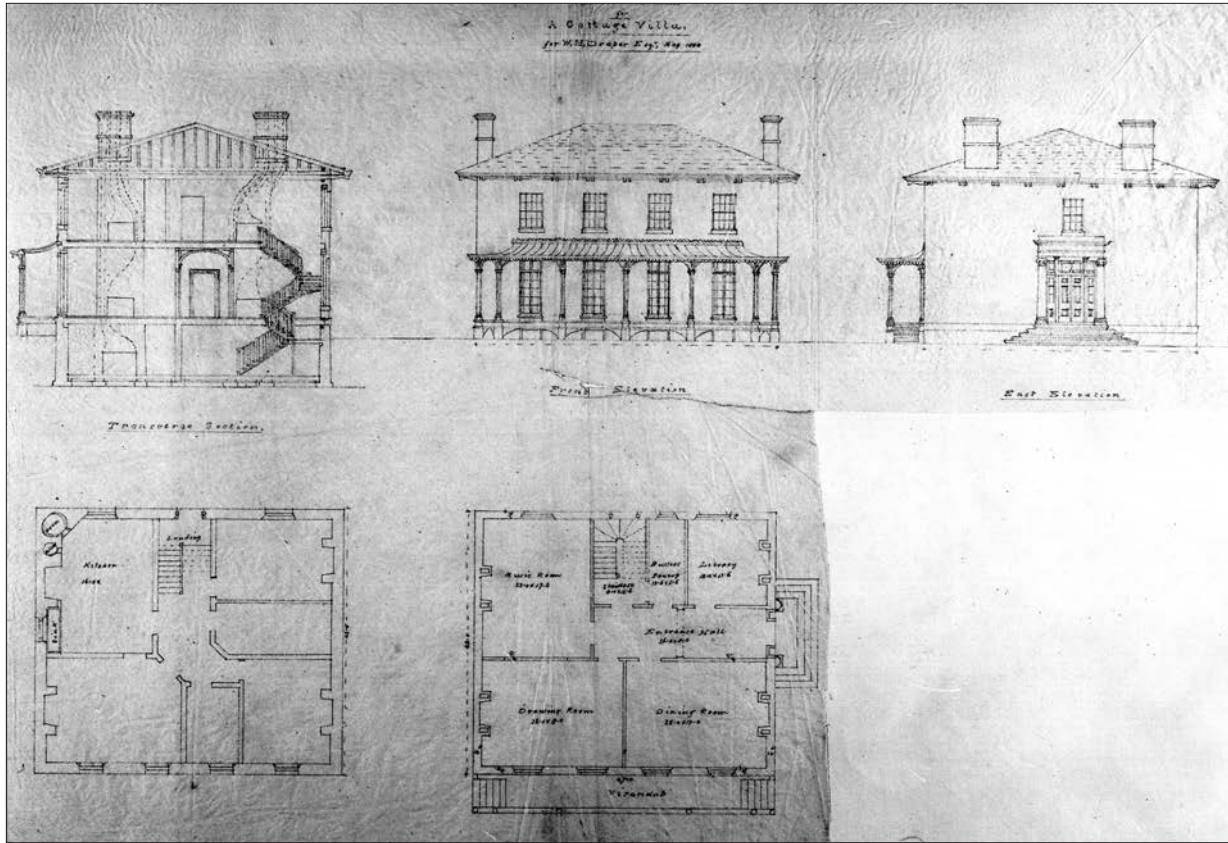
Illustration No. 4: the plans, section, and elevations for Hazeldean house by John Howard. 4 Gwynne Road. (See illustration No. 2) The name of Gwynne Road was later changed to Park Road. Mr. and Mrs. Draper are buried in St James Cemetery.
